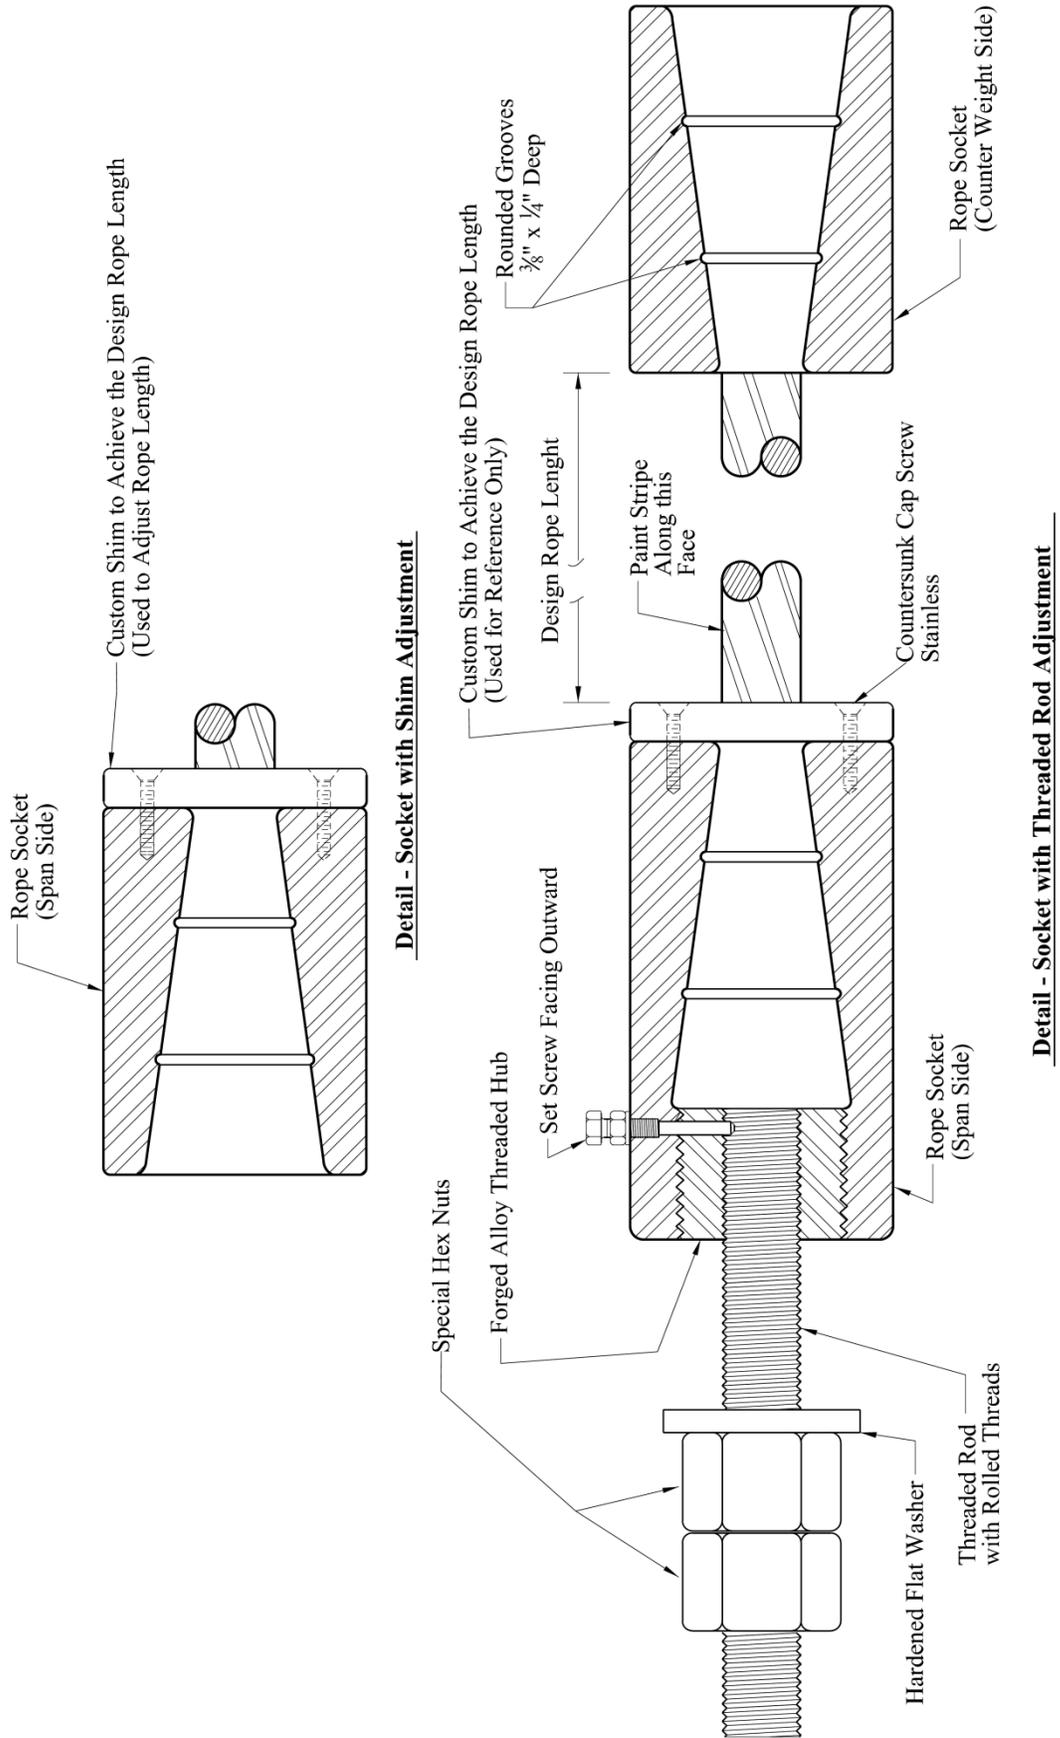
Wire Rope and Socket Assembly
